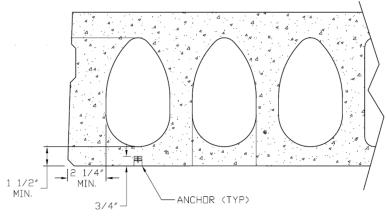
MINI-UNDERCUT+ INSTALLATION DETAIL FOR ANCHORS IN THE UNDERSIDE OF HOLLOW-CORE CONCRETE SLABS
